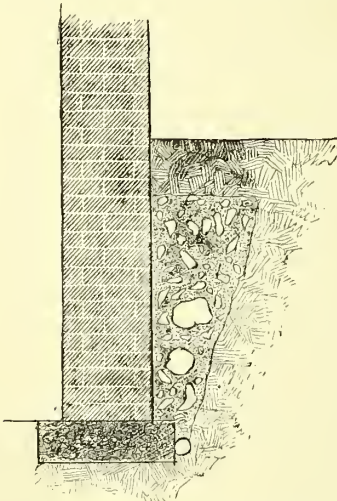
Tile-drain at the bottom of a foundation-wall.
